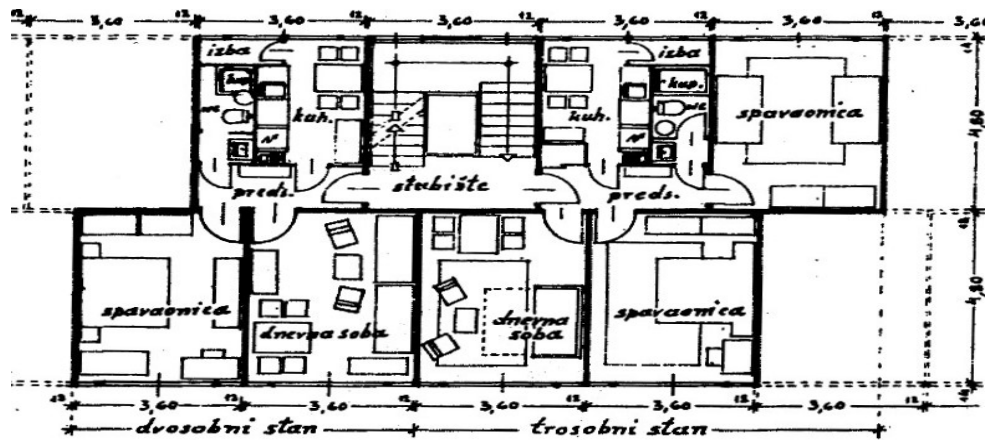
Ground plan of 2 units accessible from one staircase JU-61 type (Peulić 1973)
